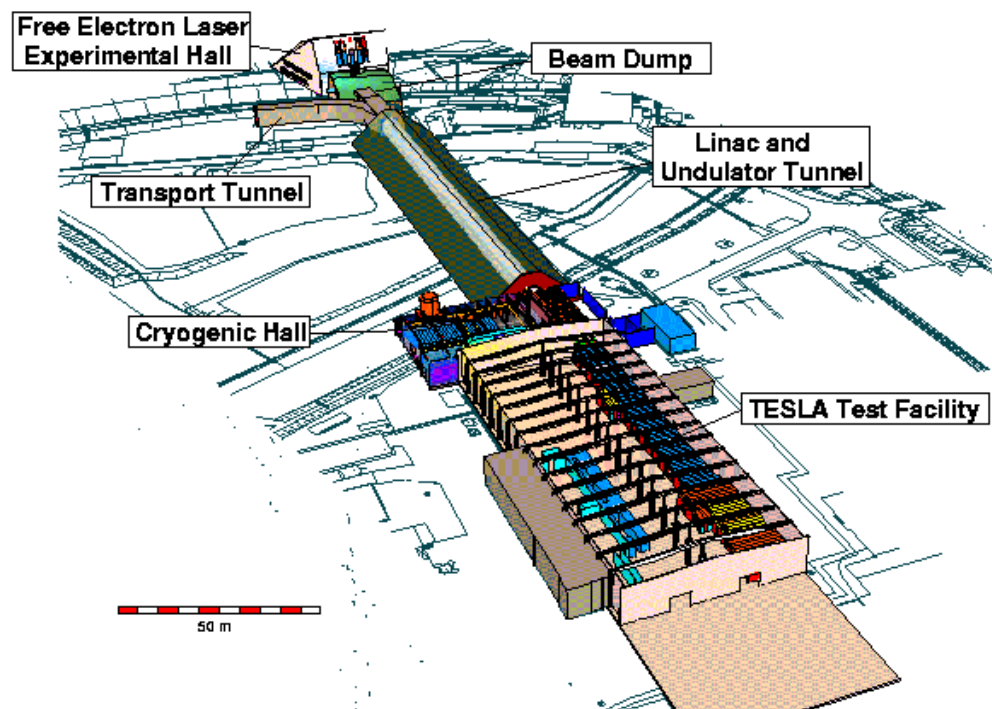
Layout of the 1 GeV TTF-FEL user facility: TTF hall with 500 MeV linac (front), 1 GeV extension tunnel (above ground, same design as the underground TESLA tunnel) and experimental hall downstream the linac. This hall will be used as FEL exhibition building during EXPO 2000 during summer 2000. Commissioning for the FEL facility is scheduled for 2002.
